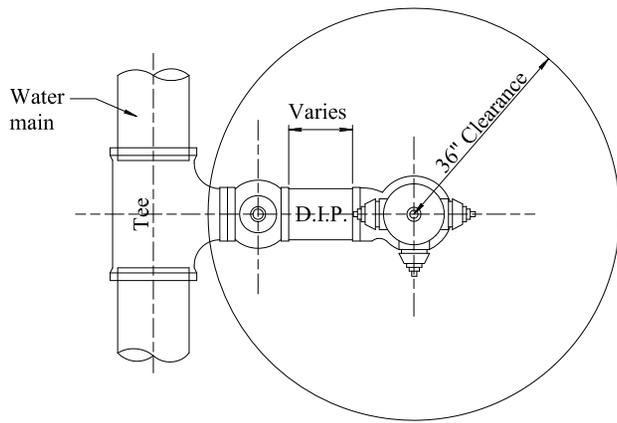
STANDARD DETAIL ENGLISH	DRY BARREL FIRE HYDRANT INSTALLATION	REVISED 04-27-2011	DETAIL NO. 360-1
